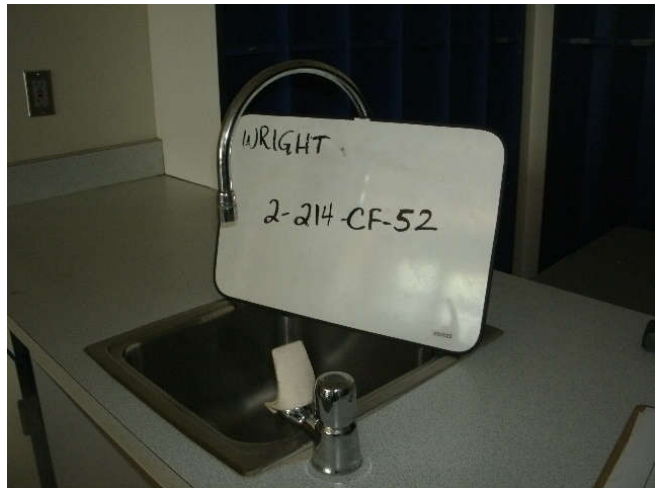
Classroom faucet w/bubbler, located on the 2nd floor, in room 214.
